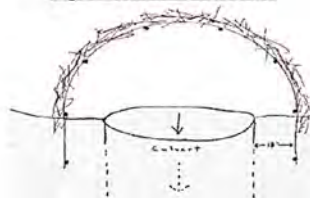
An example diversion dam schematic from Beaver Institute's [Self Help Information - Culverts, Drains](#). Each diversion dam needs to be designed and adapted to the local site conditions by a trained professional.
